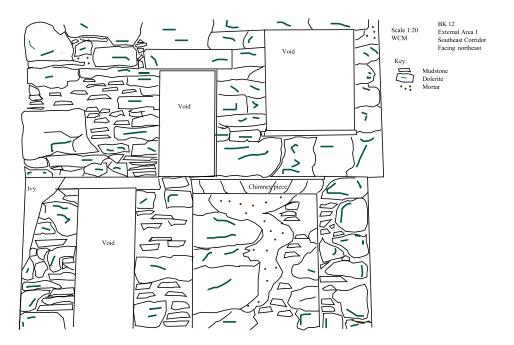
Elevation plan of External Area 1 of the Lower House showing two stories, window and doorways. Drawing: WCM and
